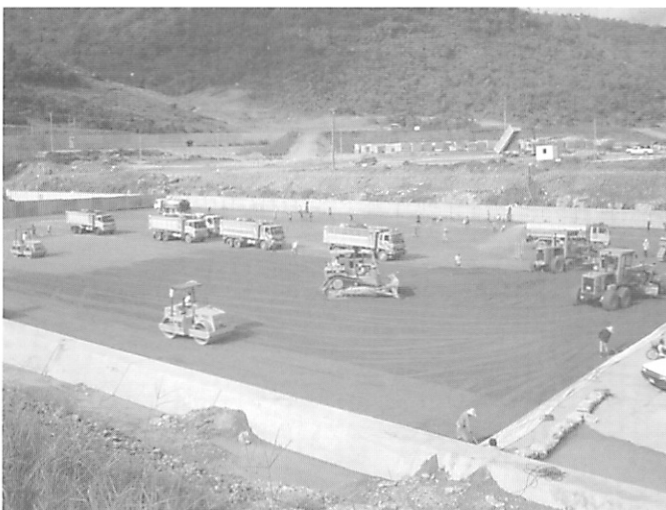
RCC was transported to the construction area by conveyer belt and trucks
